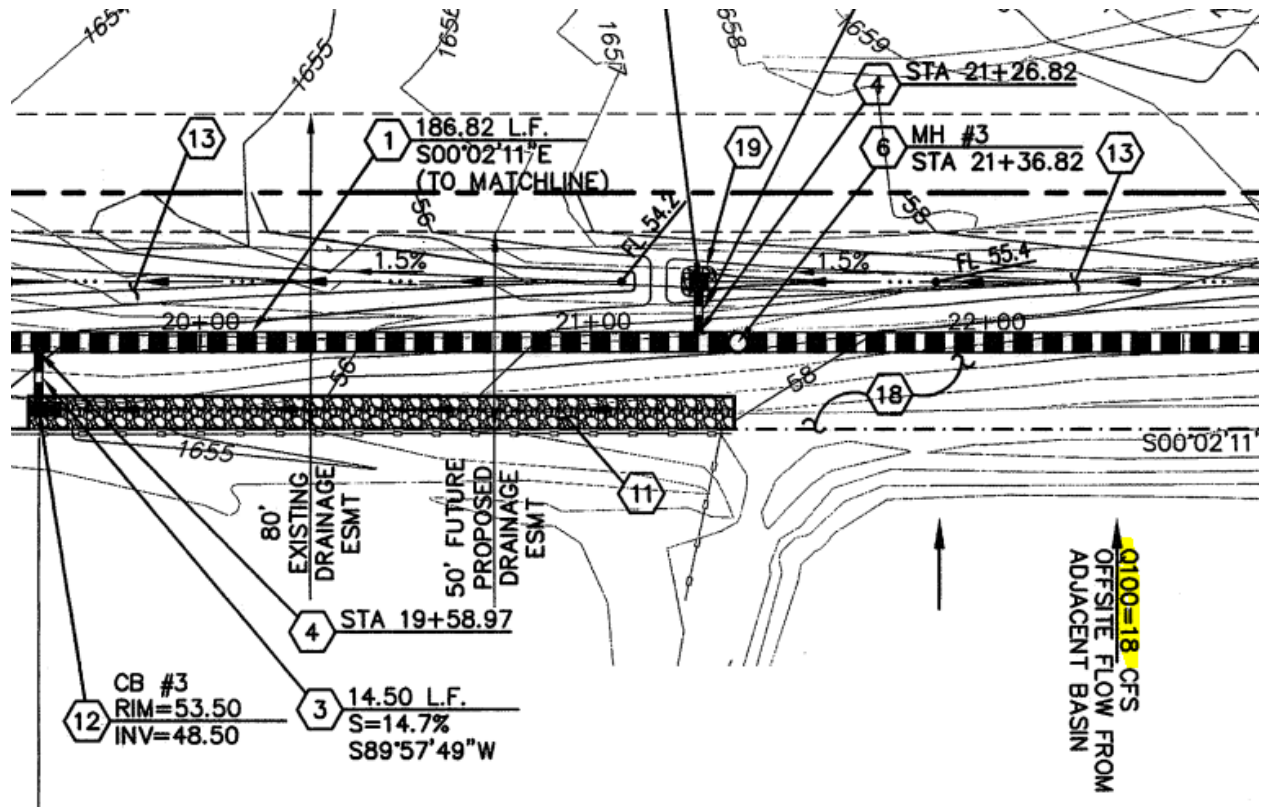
Off-site Inlet Location about 600 ft South of Upstream End (Excerpt from Design Plans)
